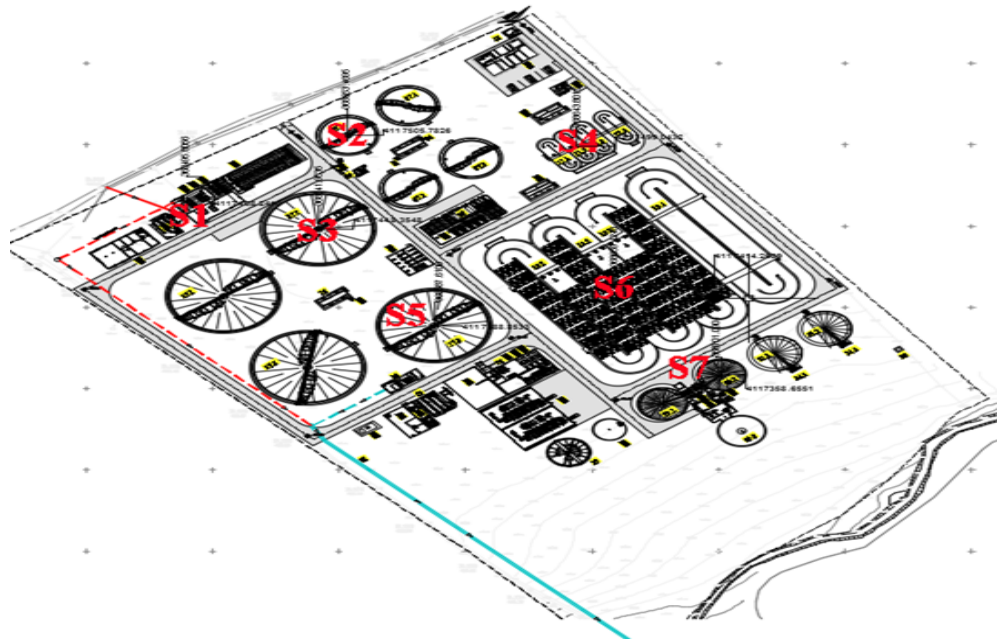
The layout of the Wastewater Treatment Plant and Locations of the Soil Borings
